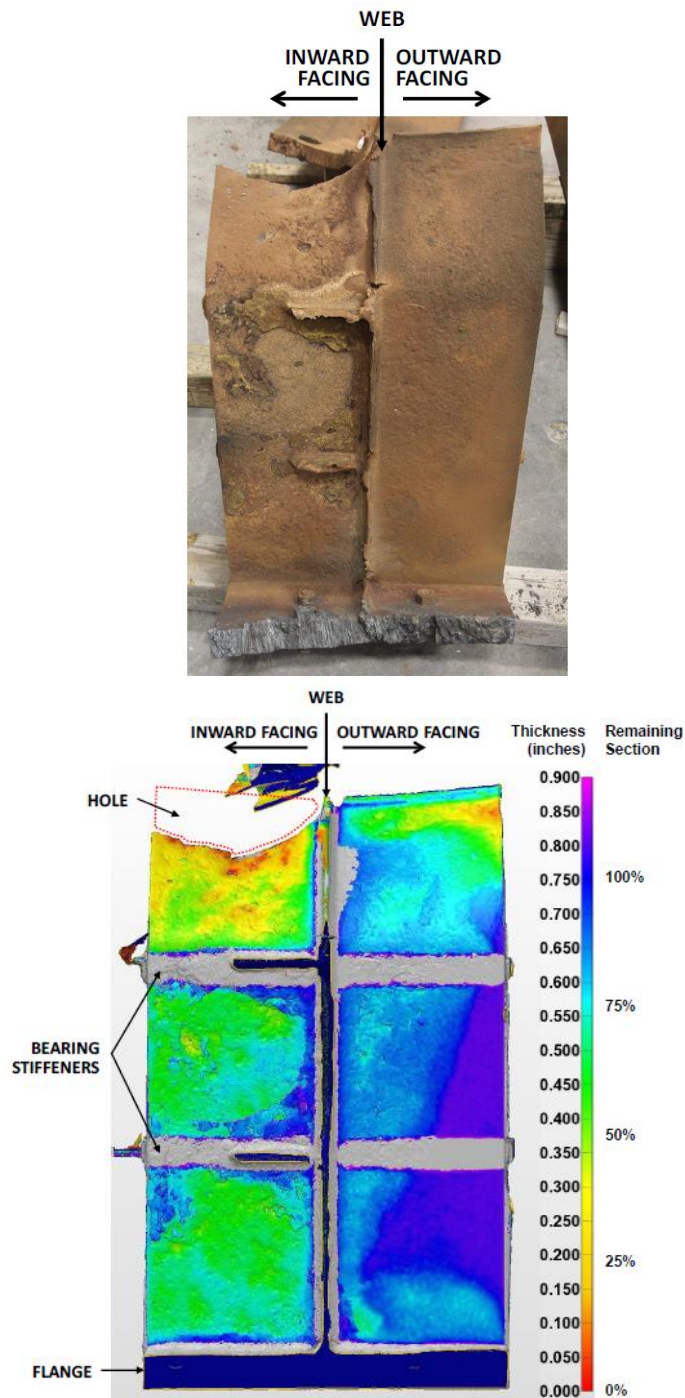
Photograph and 3D laser scan image showing remaining section of southwest bridge leg (B1R) transverse tie plate. According to the design plan, the nominal thickness of the tie plate was 0.75 inches.
